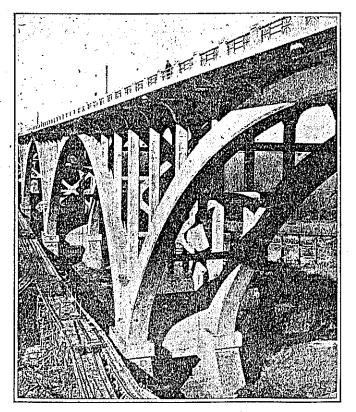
PORTION OF FINISHED BRIDGE Sidewalks cantilevered over arch ribs. Metal parapet between concrete posts. <u>Construction trestle</u> at left.
